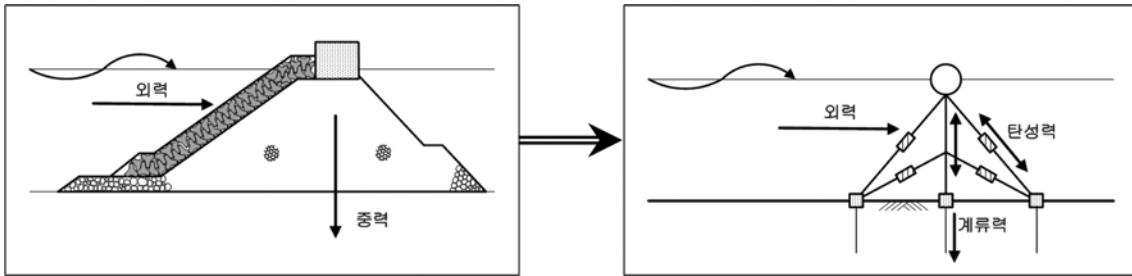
Transfer from concrete structures of gravity type to membrane tension structures with high strength.
